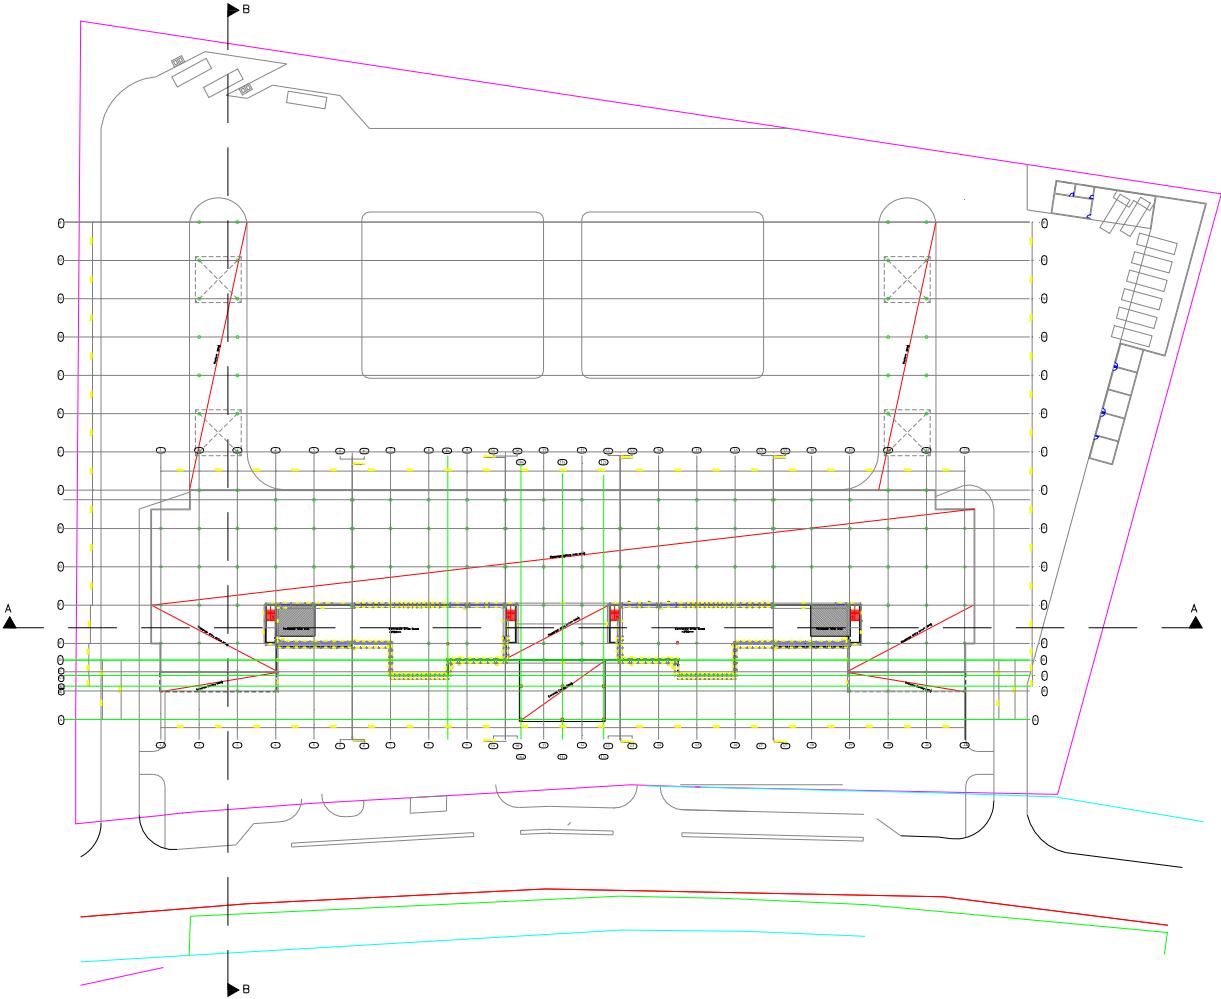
First Floor Plan of the Proposed Bus Terminal
